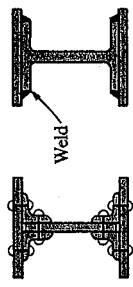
Typical beam sections consisting of several components: (a) plate girder, (b) I-beam reinforced with plates.
